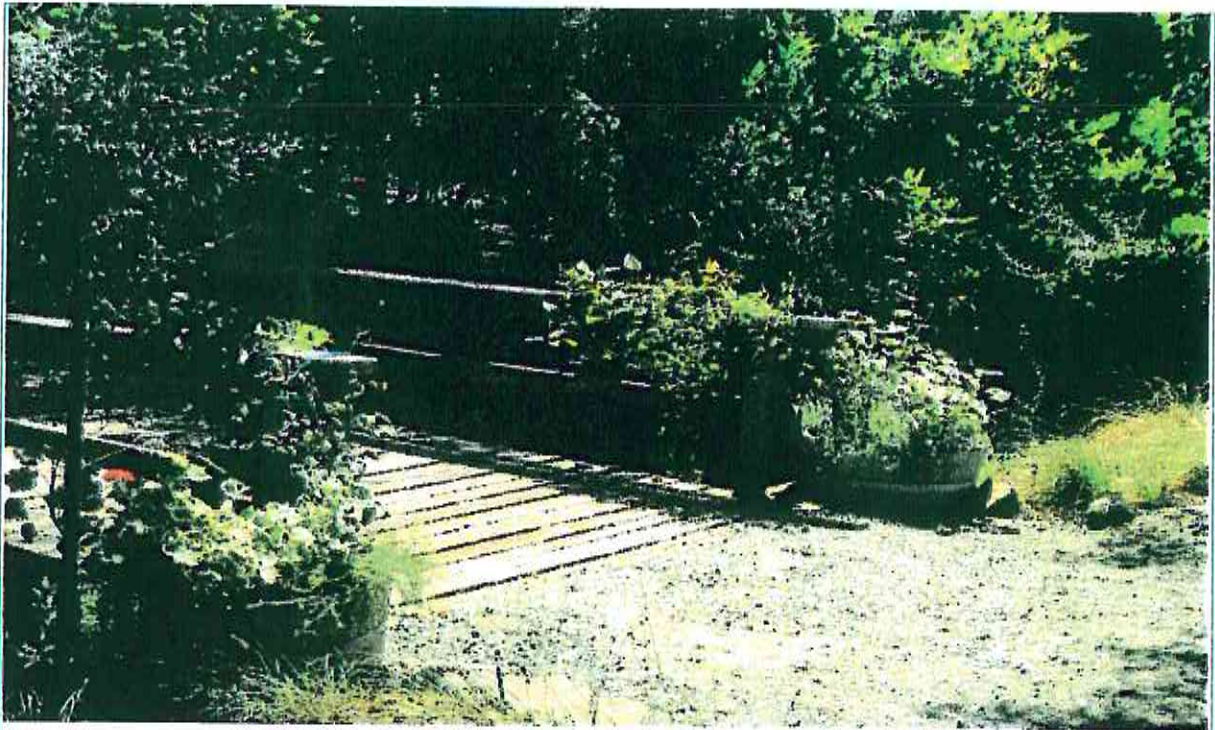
Teal Creek footbridge with vegetation overgrowing from outside the top of bank
